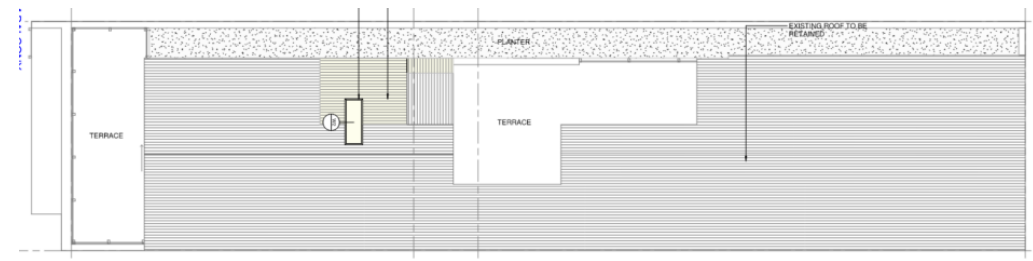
Approved roof plan under DA/660/2003/C - 7/274 Arden Street, Coogee (Source: Place Studio)
